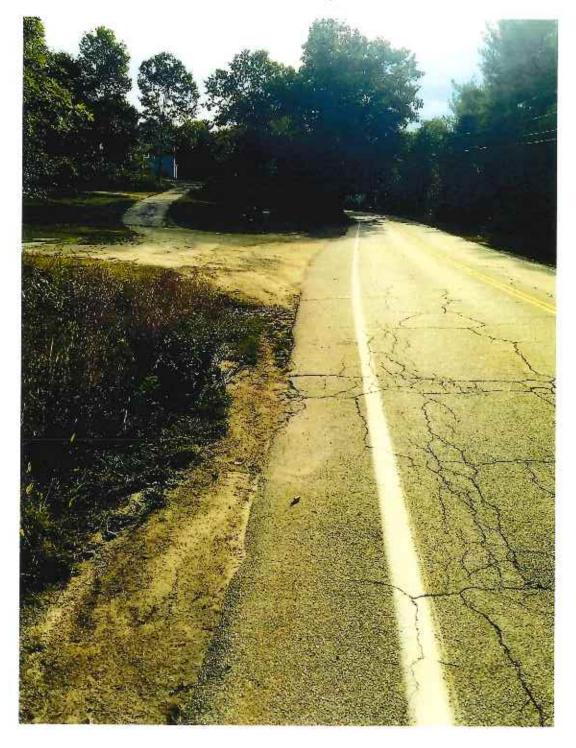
Existing driveway to receive roadside ditch culvert.
